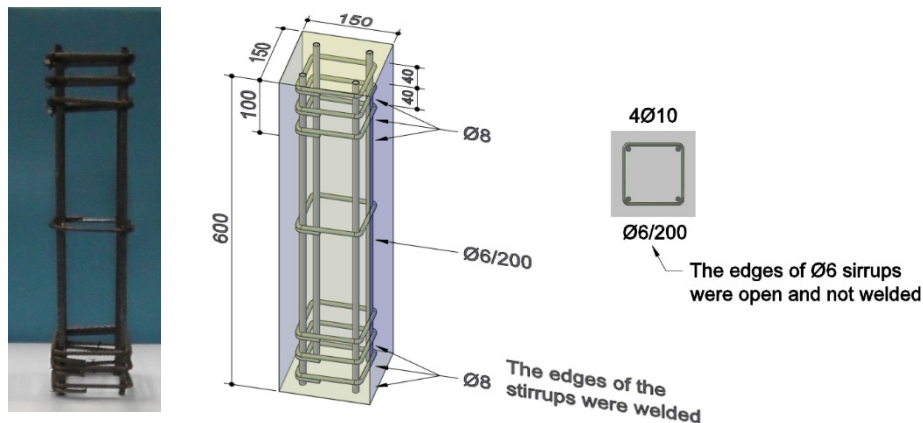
Geometry and reinforcement detailing of the columns (dimensions in mm).
